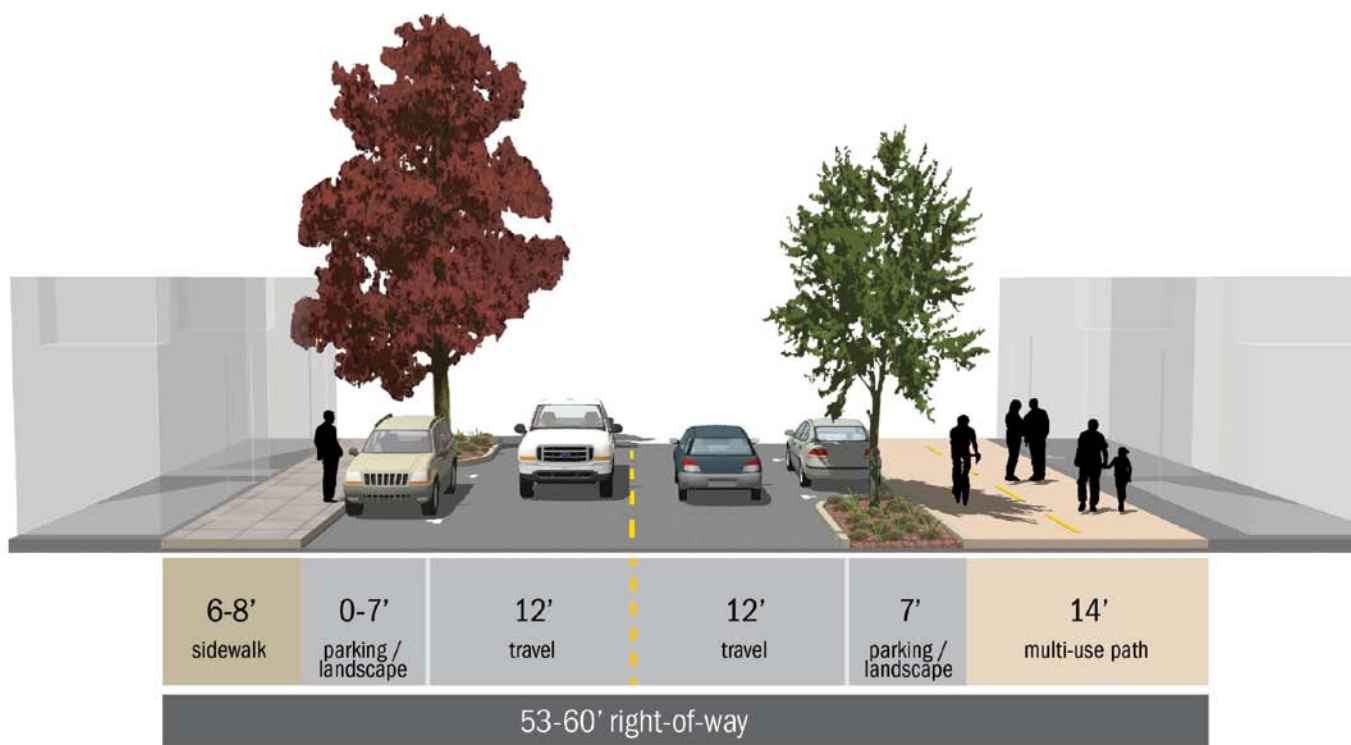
Conceptual Cross-Section for Main Street – North of Beta Street within existing right-of-way (looking north)
